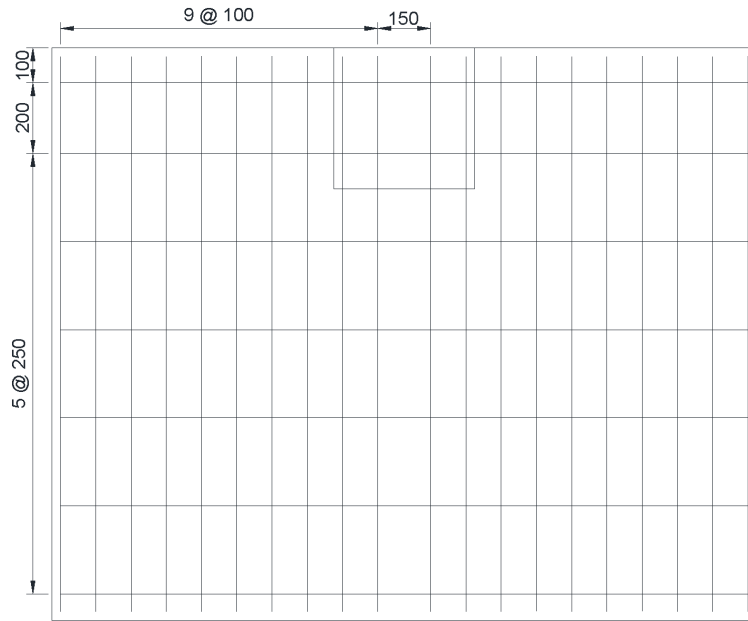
Bottom mat reinforcement details for Specimen 3 (10M bars) (units in mm)
